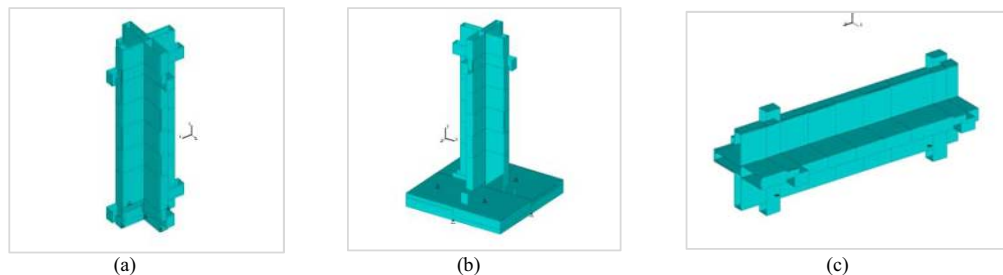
(a) Column without Footing, (b) Column with Footing, and (c) Column for Bending Test Capacity
